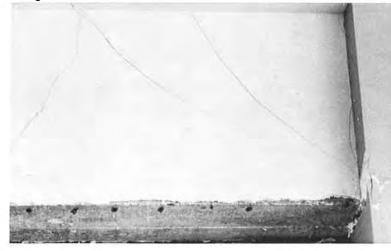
Fracture of Joint at Interior Column, Municipal Building
